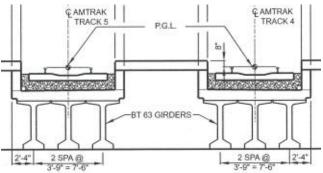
AMTRAK bridge with Adjacent BT 63 Girders
